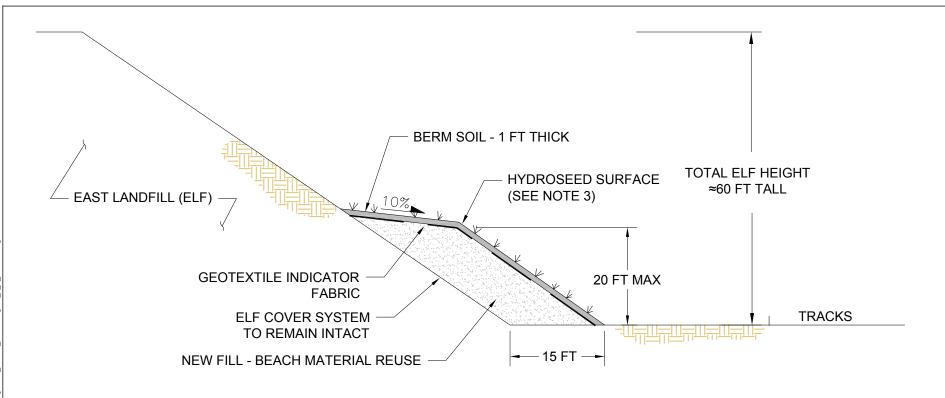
Excavation and Reuse Typical Cross Section Evraz Oregon Steel
